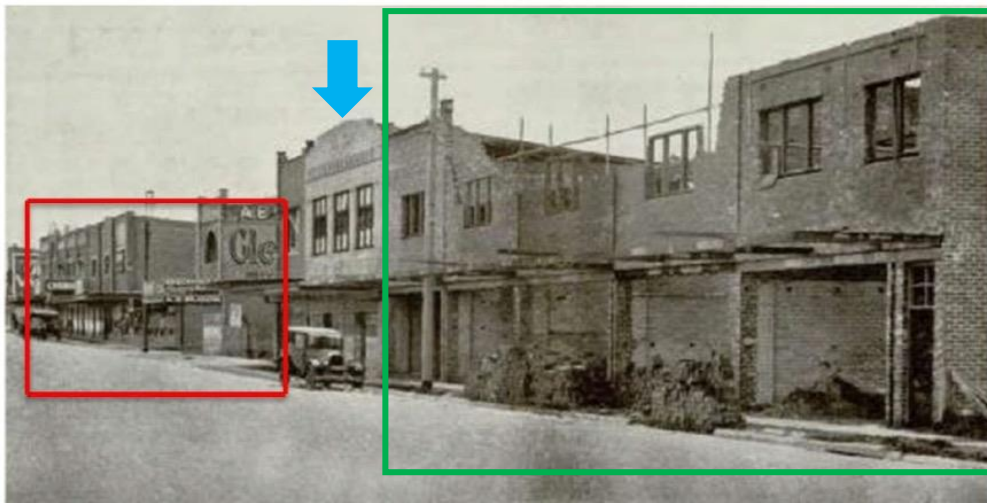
A photo of the north side the Ashburton Shopping Centre, published in 1934. The building at 269-271 High Street is evident, indicated by the blue arrow. The five two-storey brick shops and dwellings at 273-281 High Street) are shown under construction (outlined in green). The two-storey shops, believed to be 245-253 and 259 High Street, constructed in the 1920s, are outlined in red ('Tower Hill Estate' 1934).
